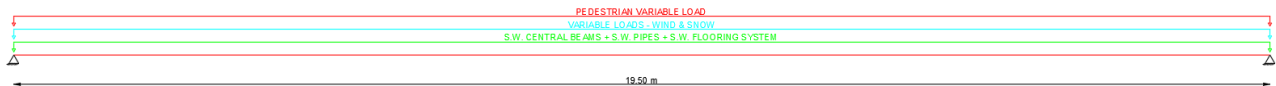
Static Scheme Description – Central Beams – Deck Central Position - Geometry and Applied Loads
